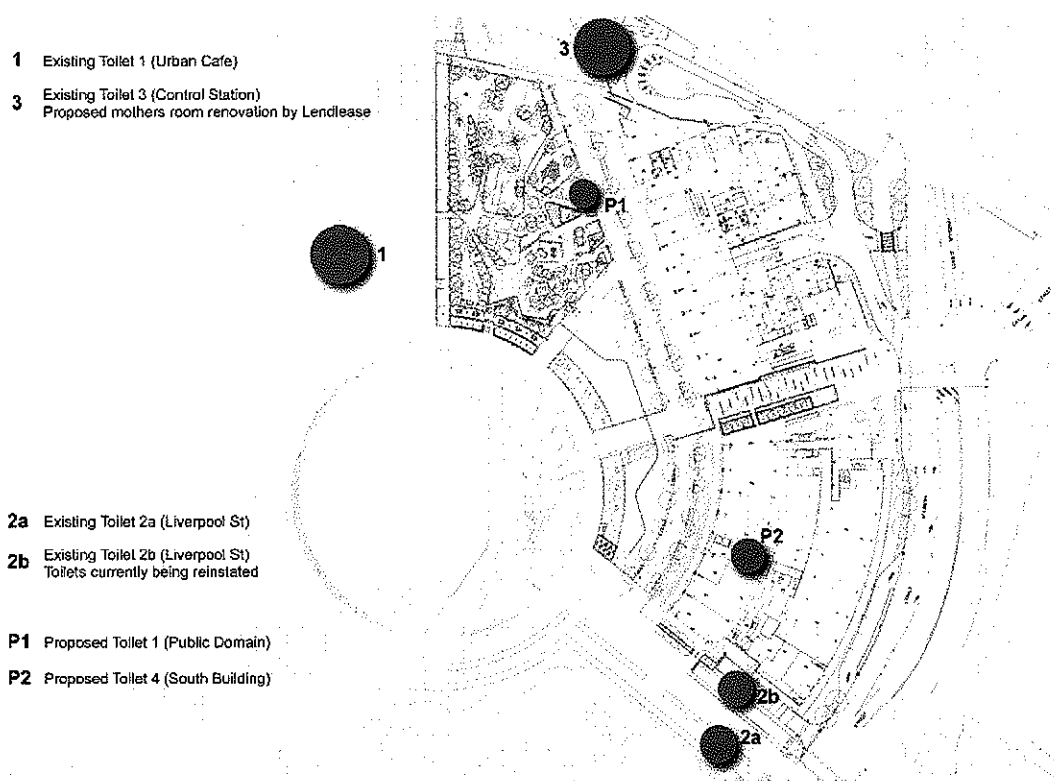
Public Amenities within and surrounding the Darling Walk development
